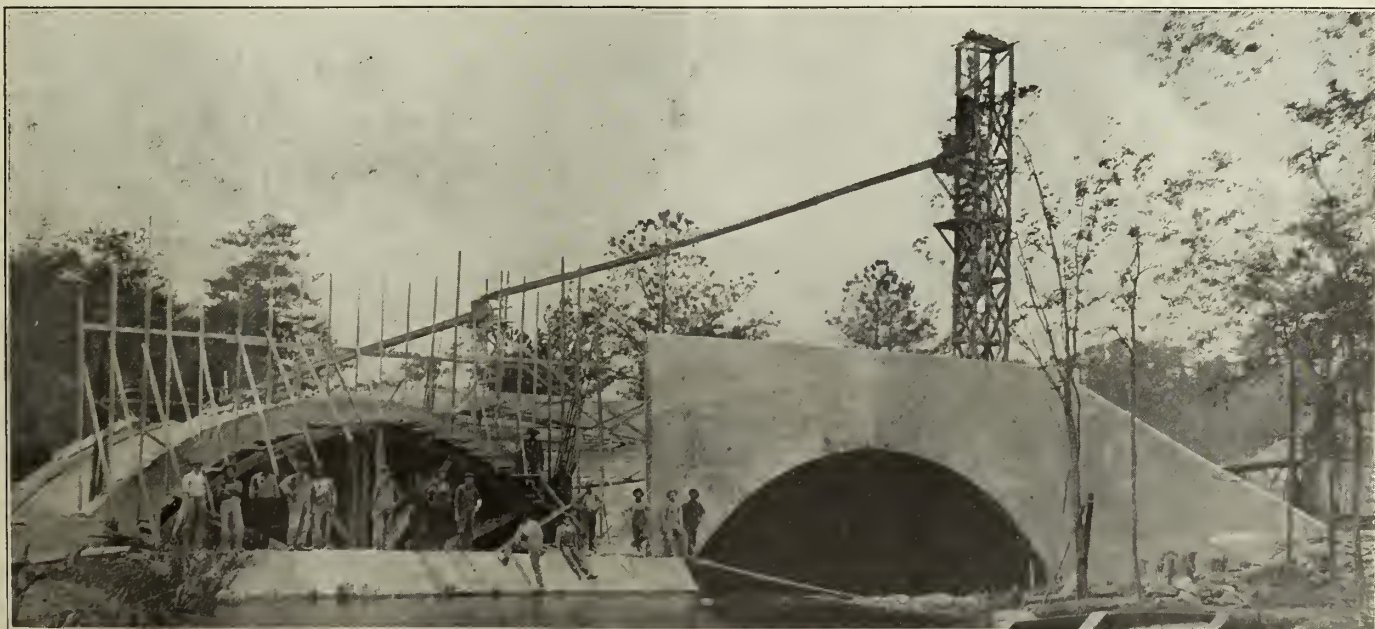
Double Concrete Arch at Gurley Creek, Under Construction, Louisville & Nashville R. R.
